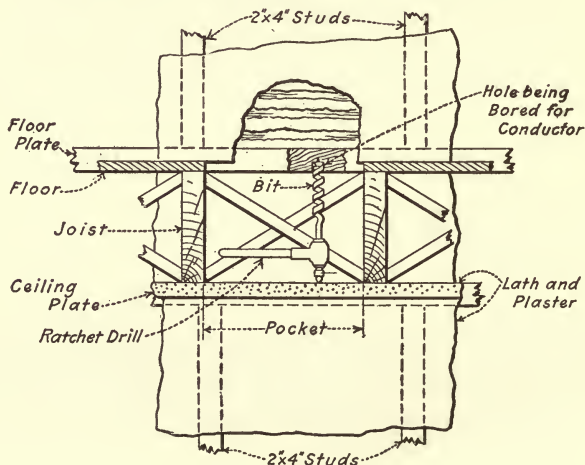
A.—Application of the ratchet drill for boring a floor plate.
